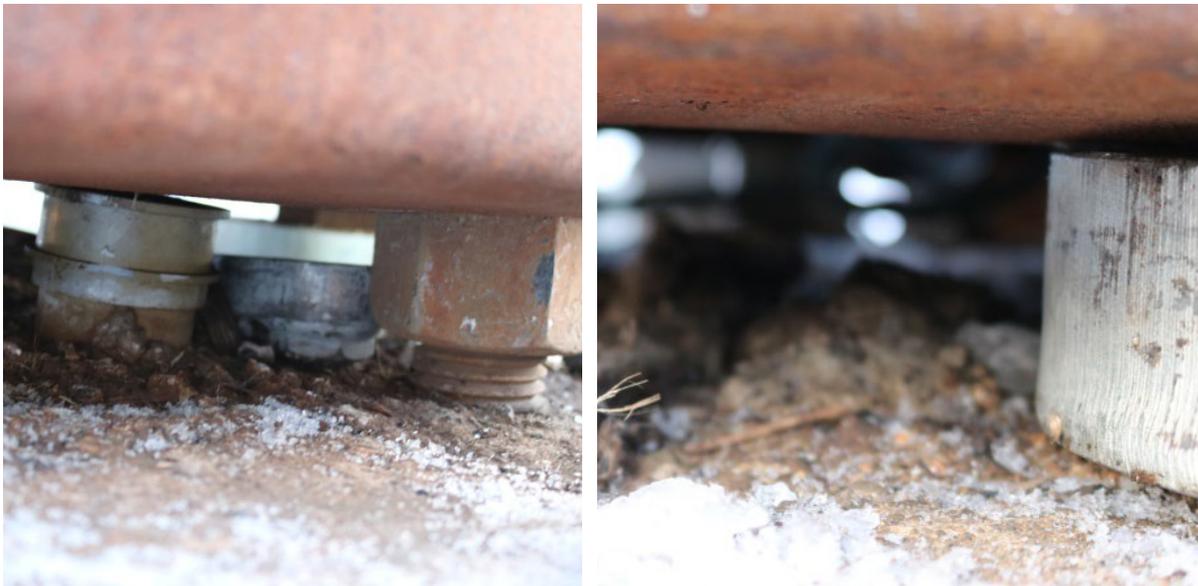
Clearance Issues with conduit placement (left) and with foundation finishing (right)
